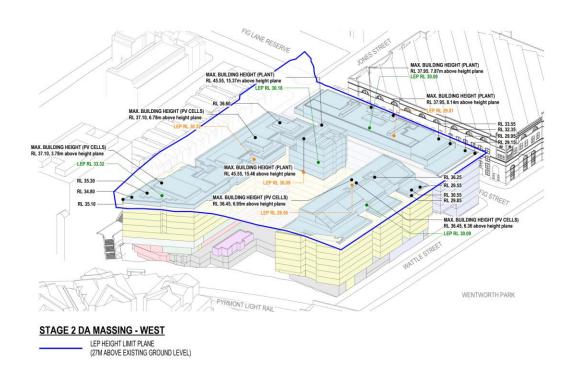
Extract LEP height limit plane (27 metres above existing ground level) – west view (Source: BVN)
